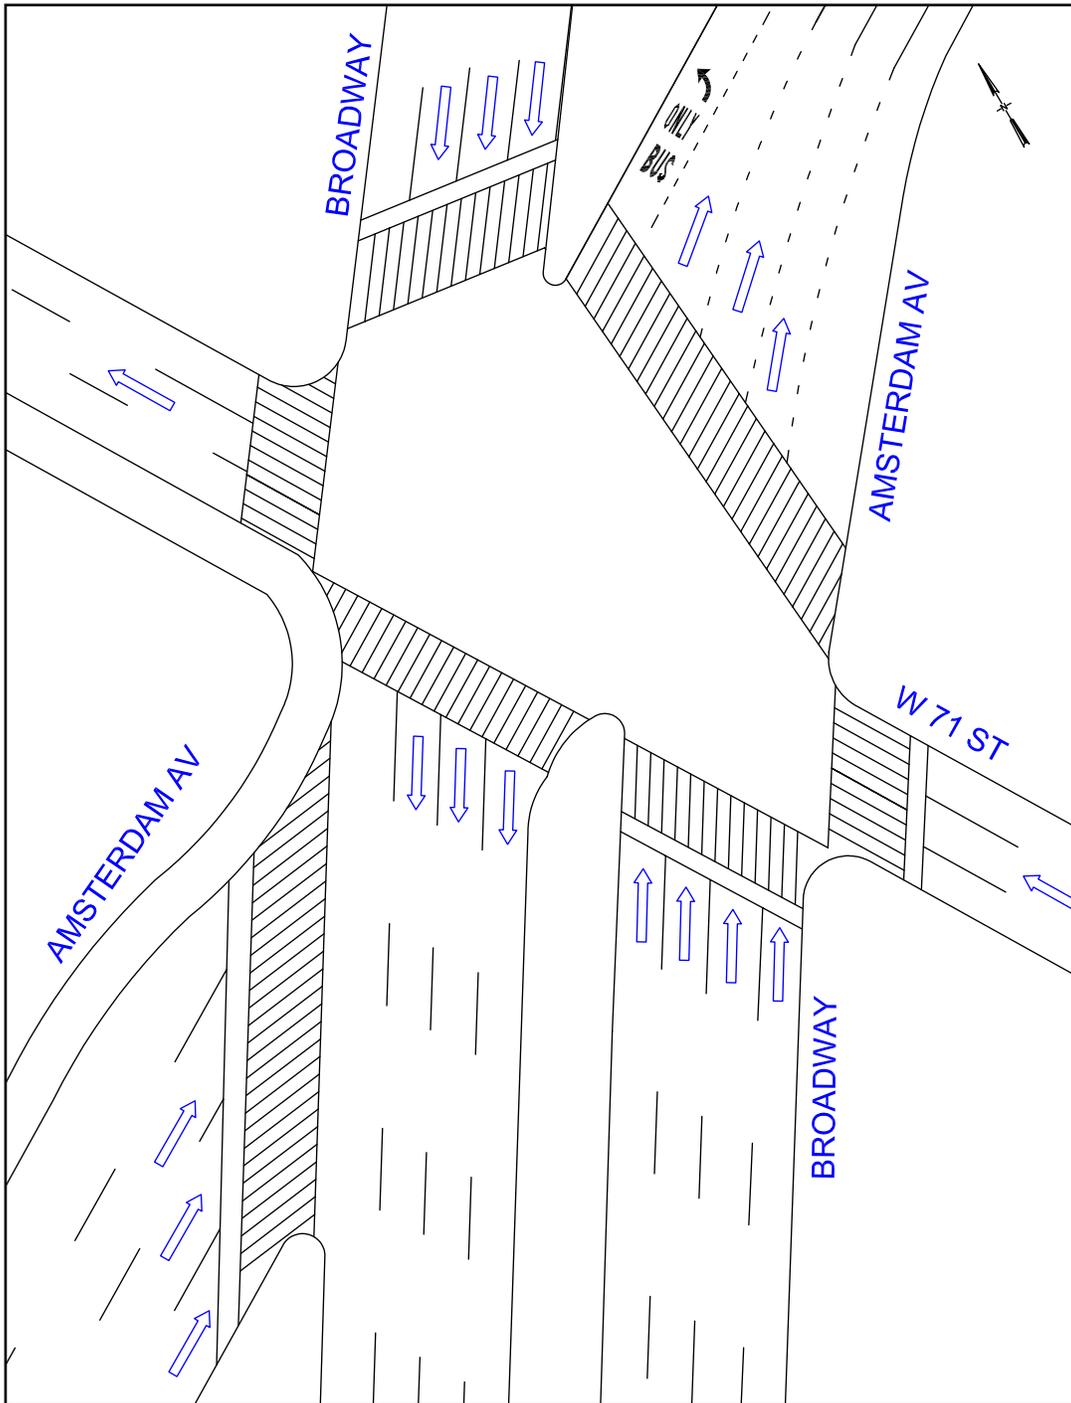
Broadway/West 71st Street/Amsterdam Avenue (Pre-Existing Conditions)
